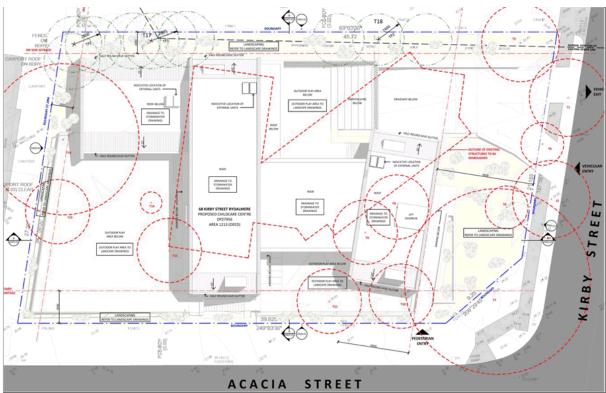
Site and demolition plan of the proposed development (source: ArtMade Architects).
